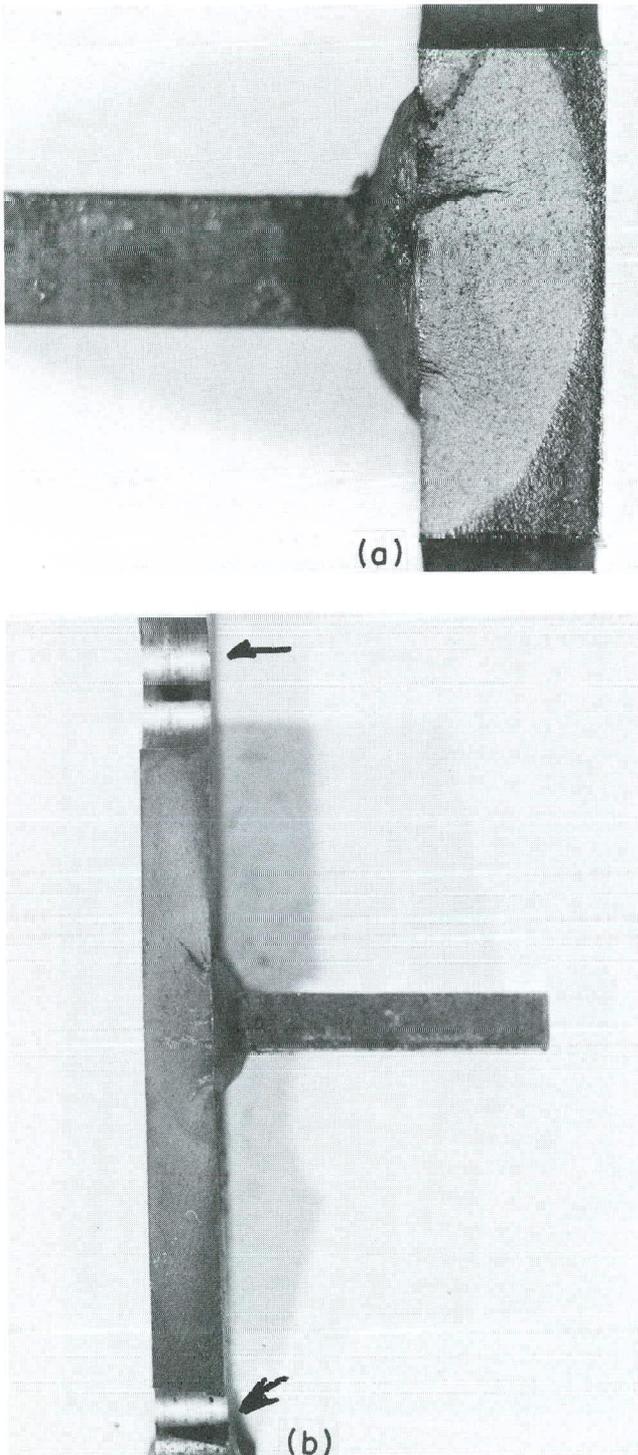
Fatigue cracks in girder web from web gusset (arrows point to drilled hole).
